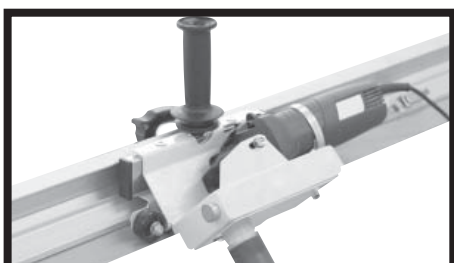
With tile cutter rulers, one can use hand-held angle grinders, fitted into special frames that can be "fit onto" the cutting guide (such as Free-flex 35°/55° by Raimondi). In this way it is possible to produce 90° cuts and 45° cuts for bevels and jolly pieces.
